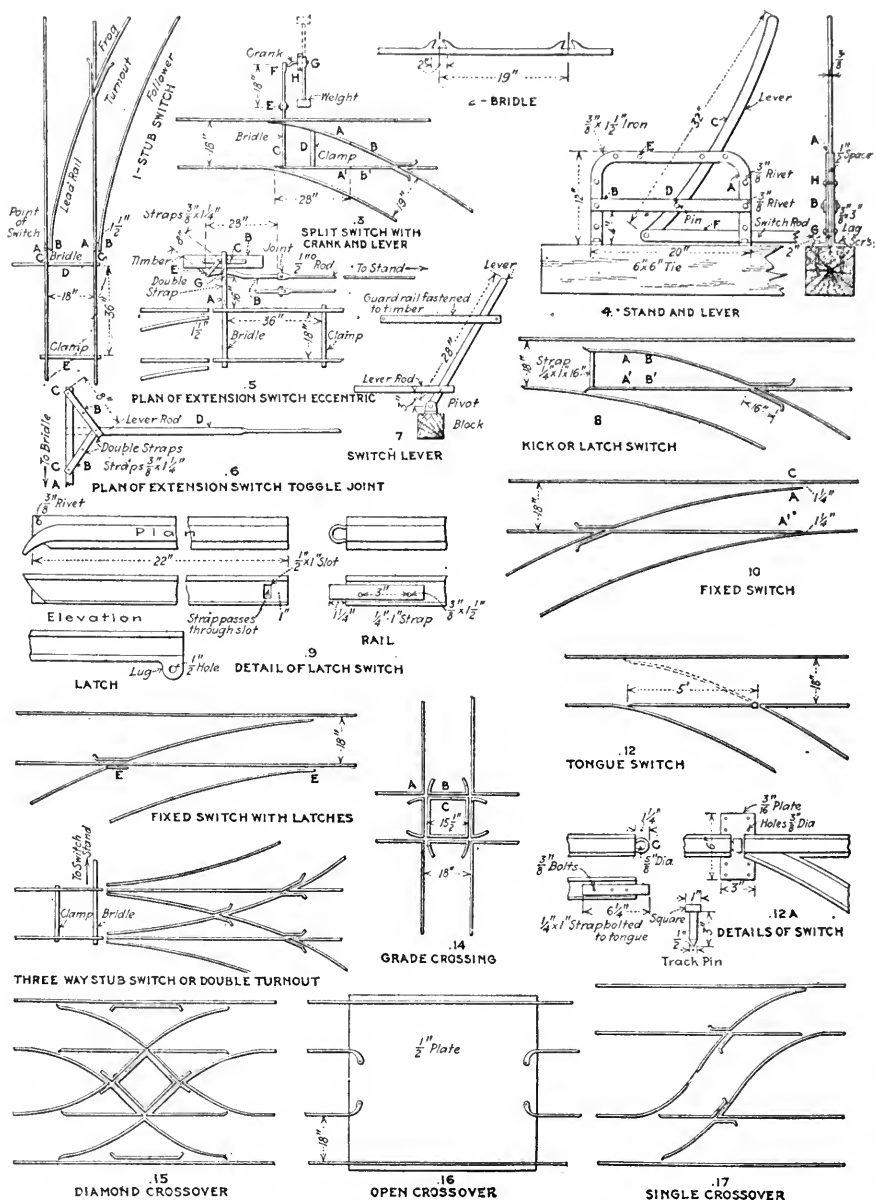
SWITCHES AND TRACK EQUIPMENT ADAPTED FOR MINE USE.
